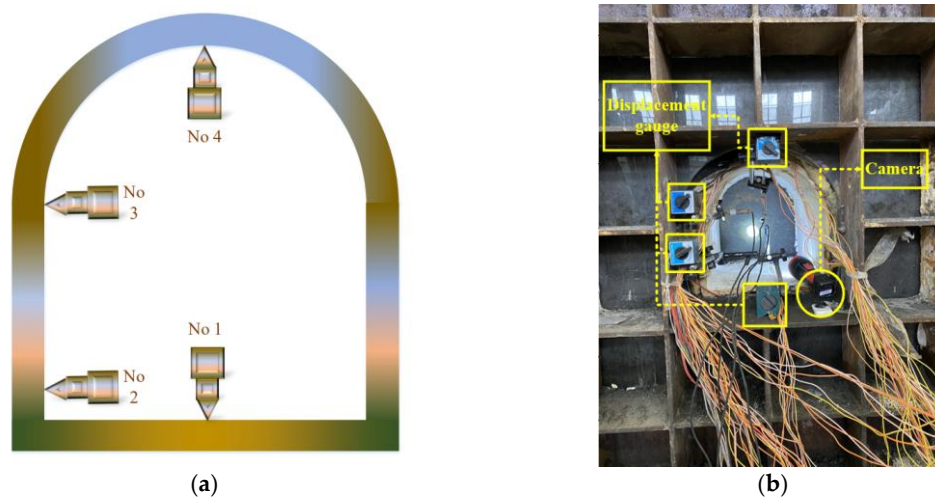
Layout of the displacement gauge and camera. (a) Displacement gauge measuring point layout, (b) Displacement gauge and camera.
